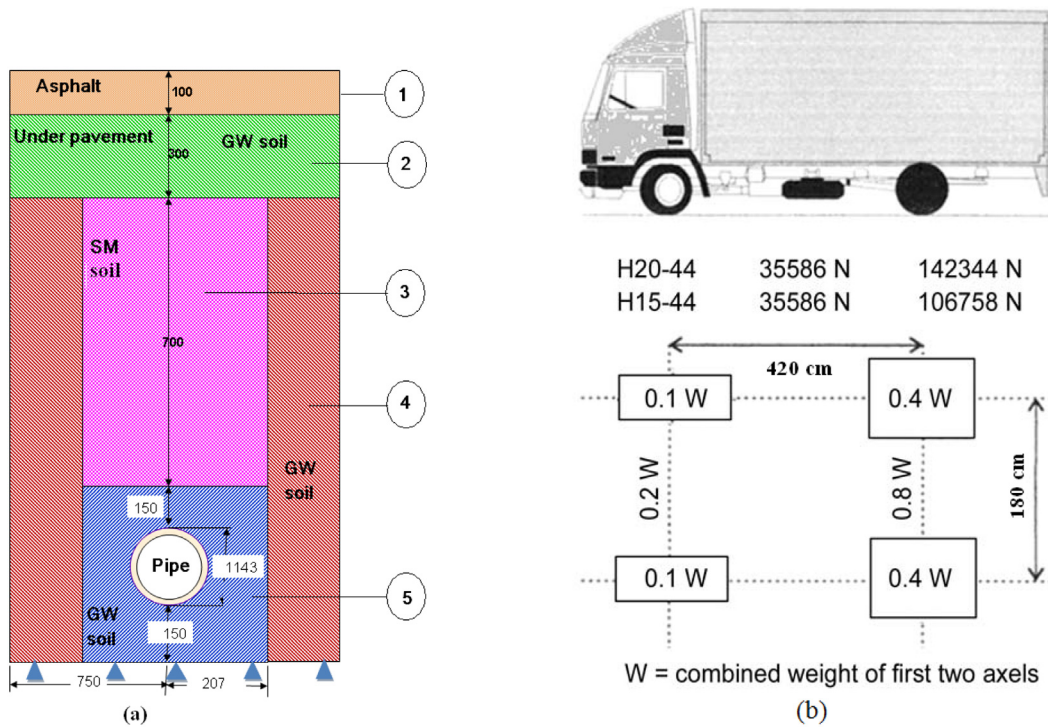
(a) Trench dimensions and pipe surrounding in mm (for description of soil layers ① to ⑤ see Table 2); (b) traffic loading [3].
